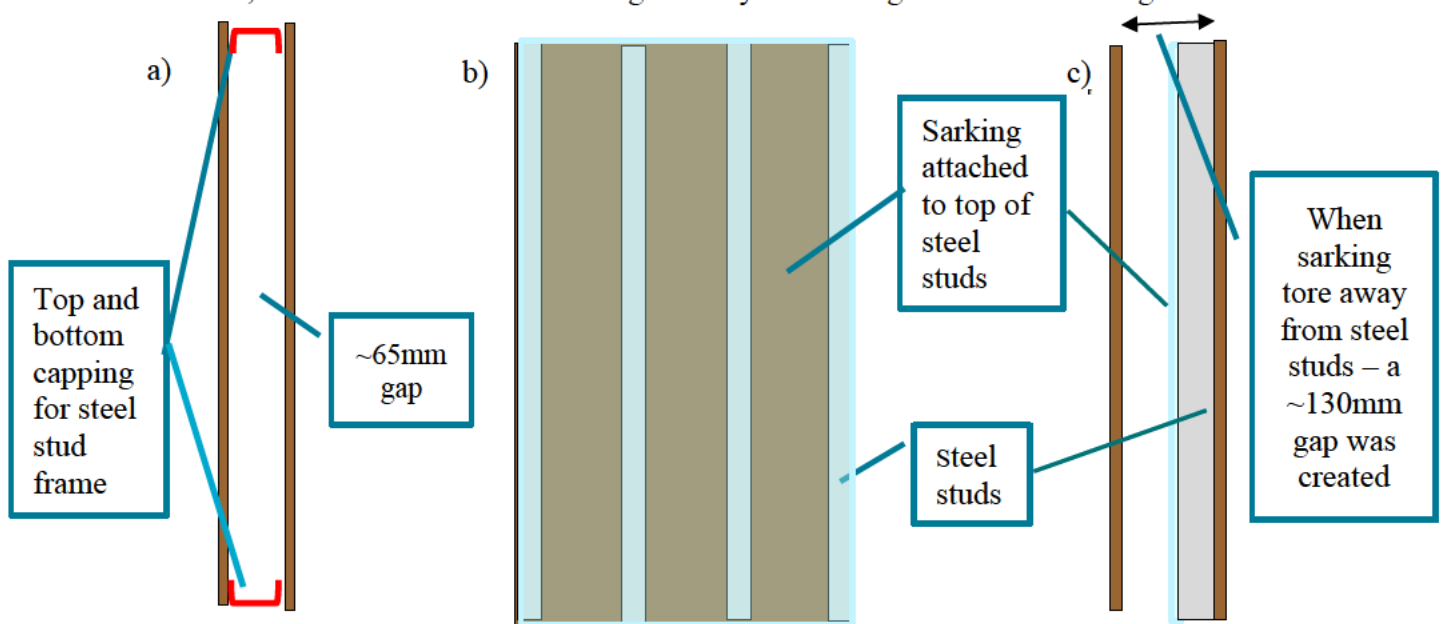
a) Cross sectional view of typical steel stud cavity (with no insulation) b) Elevation view of test panel showing installation of steel studs with sarking installed on top c) Cross-sectional view of steel studs and sarking within cavity. Images are not to scale.
